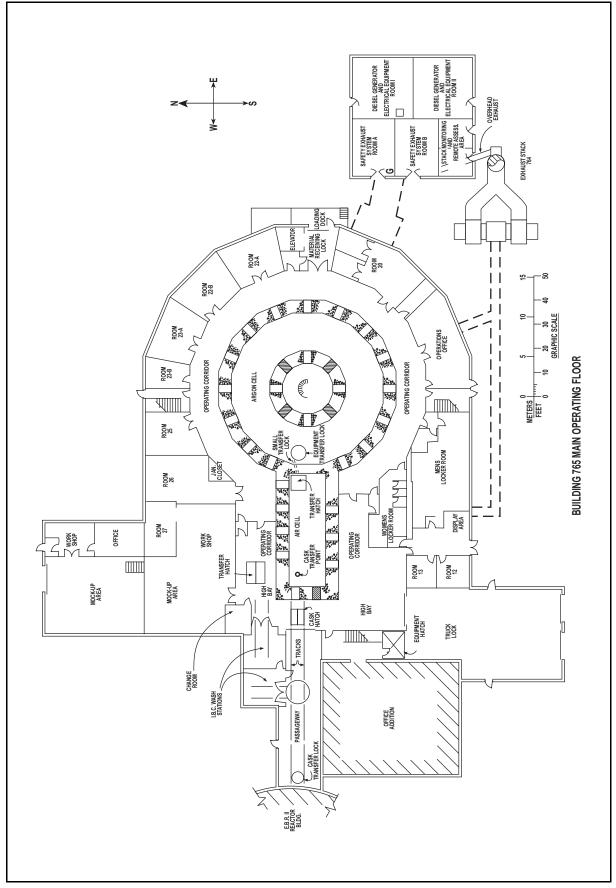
Main Floor Layout of the Fuel Conditioning Facility at ANL-W
